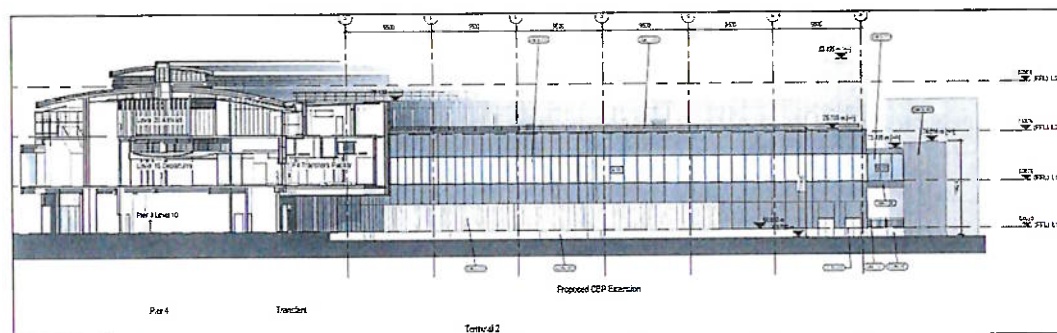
Proposed CBP southern elevation (Pascall + Watson, 2023).
